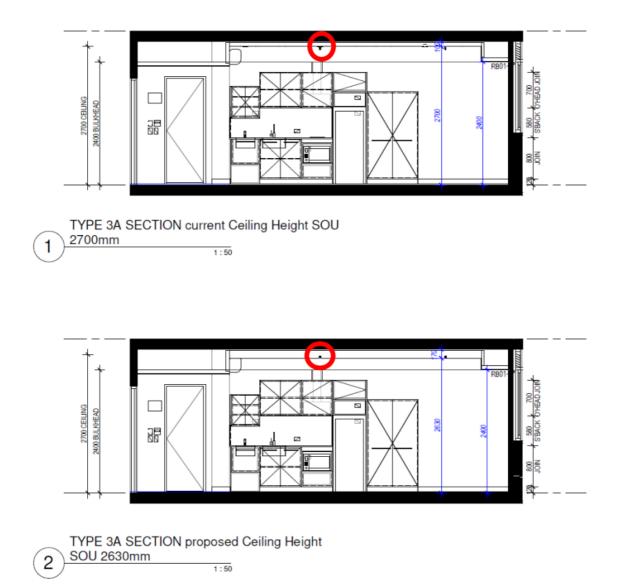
| Comparison of floor to ceiling heights and sprinkler head servicing for parts of Levels 2-18 (Source: AJ&C)
